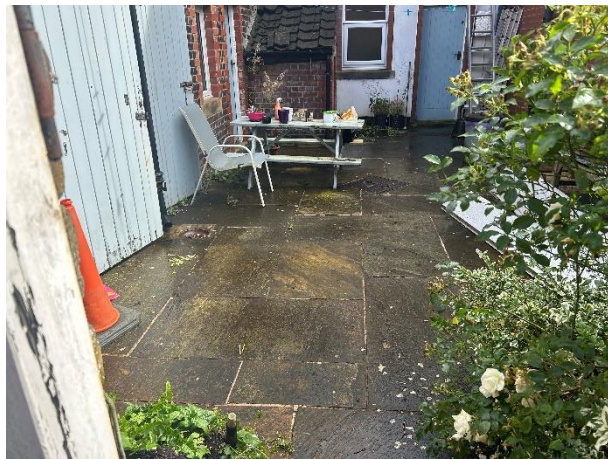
Rear of the building towards the outbuildings where the basement area is located.
